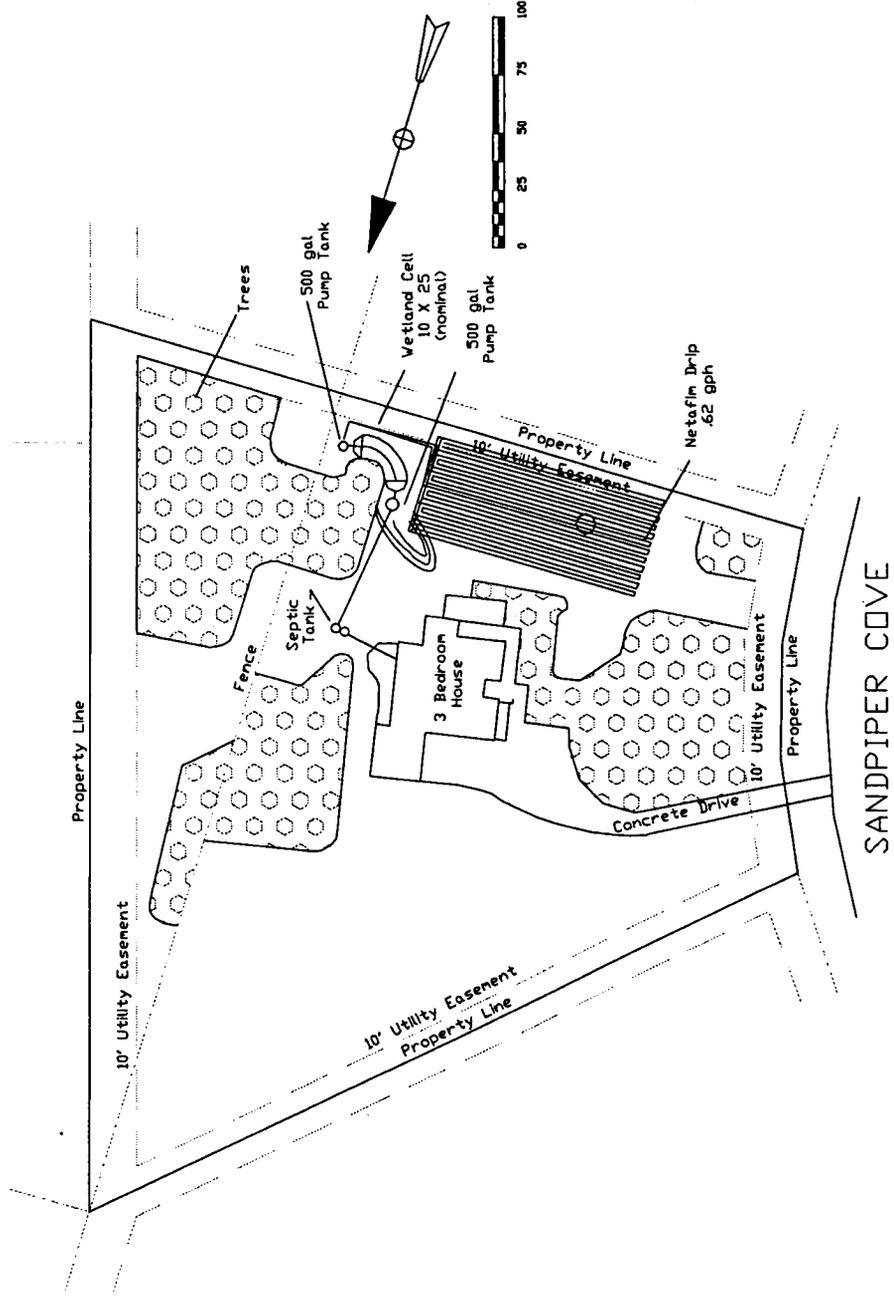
Drawing for site 4 on-site system located in College Station, Texas.
